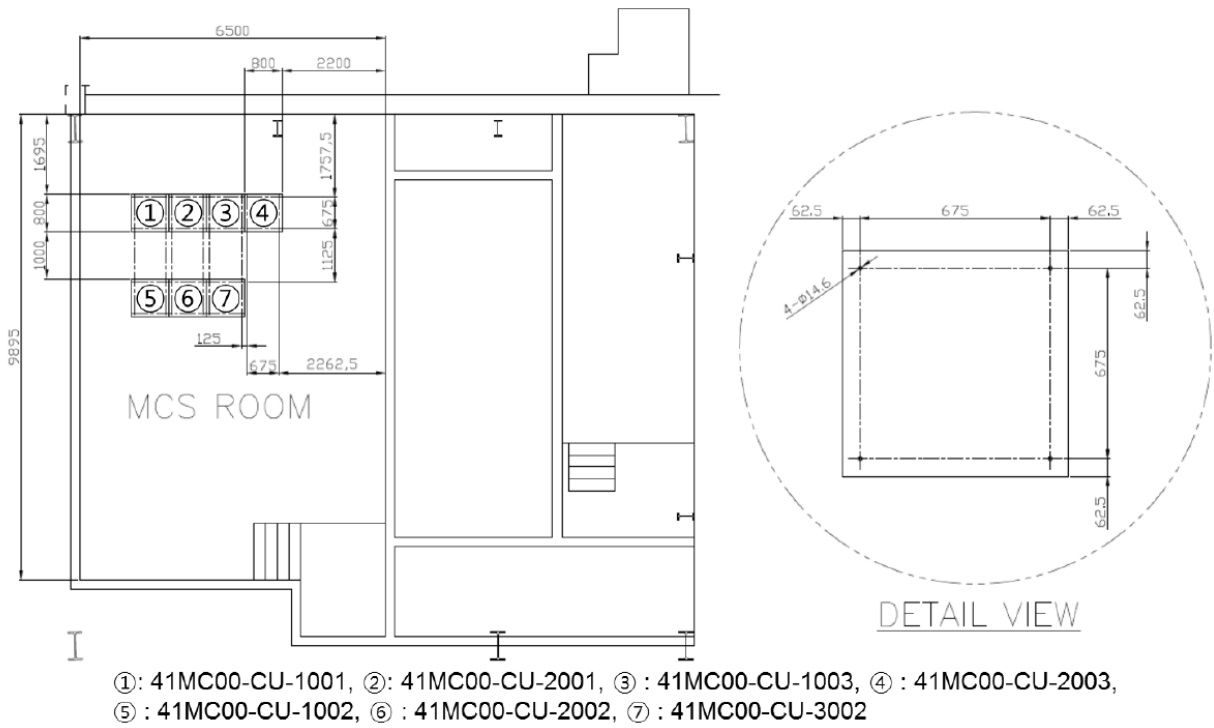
Layout of MCS room and Plan view of MCS Cubicles
